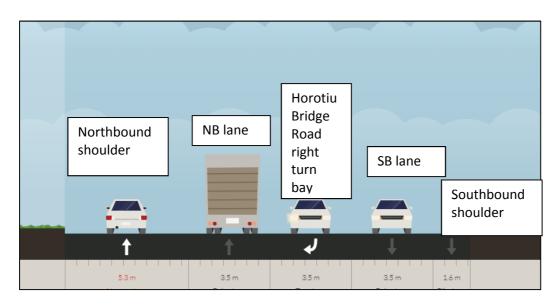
Existing River Road cross section just north of Horotiu Bridge Road.
